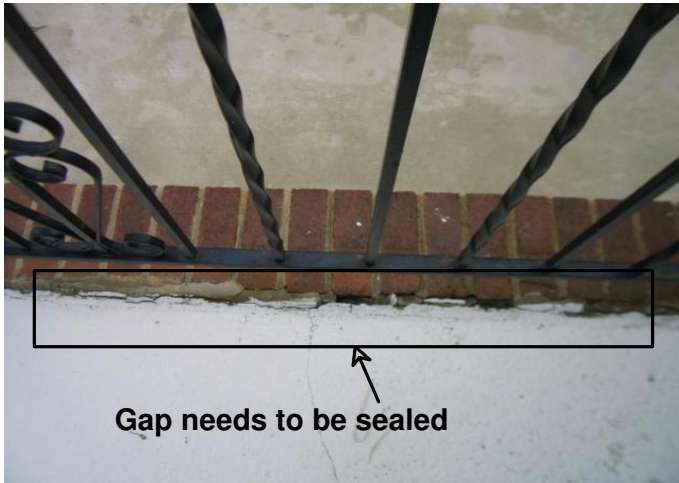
The front porch brick edging needs to be sealed where it adjoins the concrete pad to keep out water
